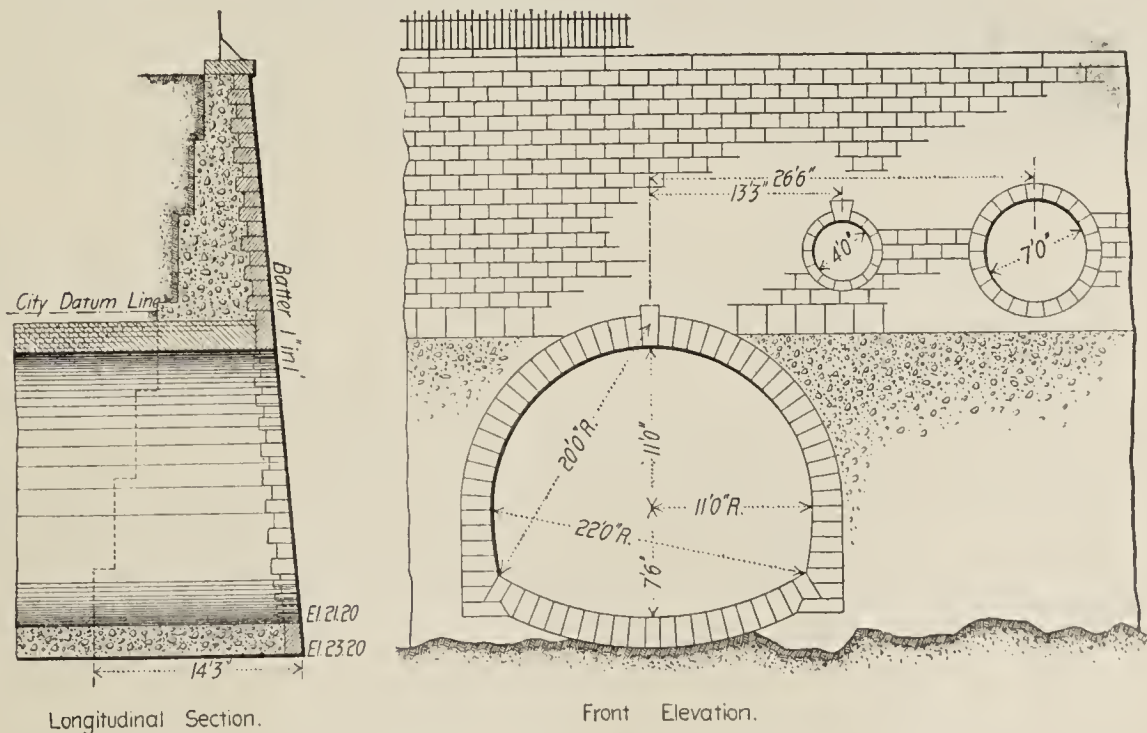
Concrete Masonry Retaining Wall at Outfall of 39th Street Conduit.
